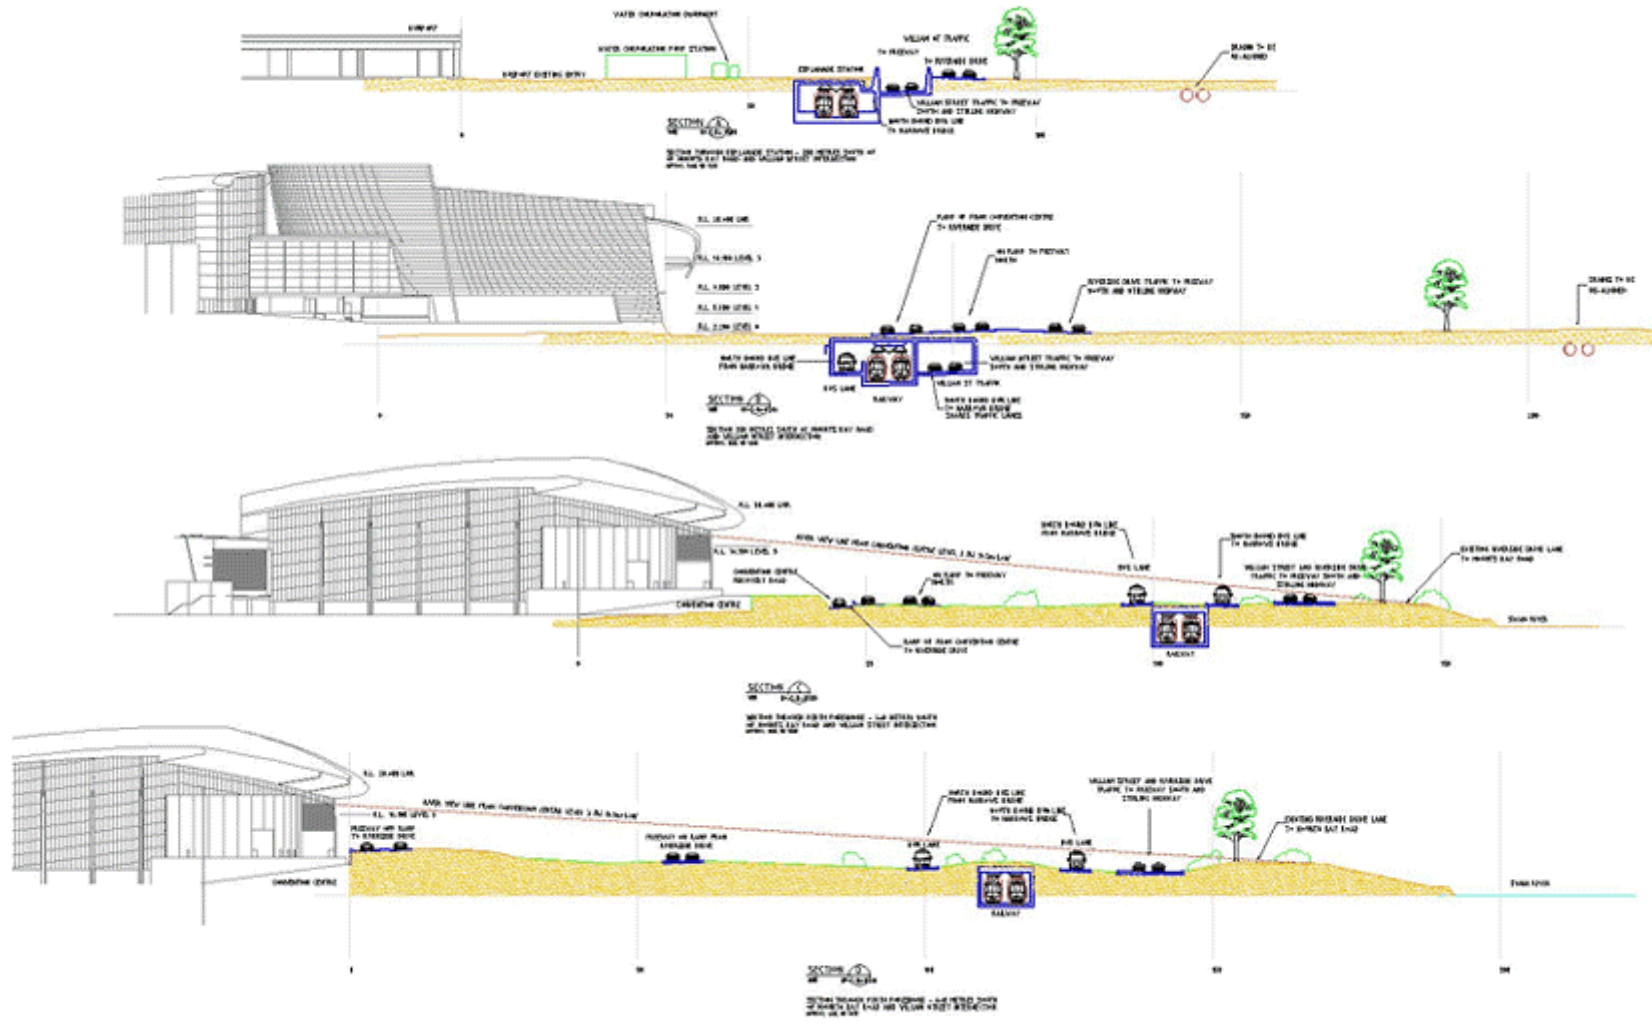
Cross Sections Showing View from Perth Convention Centre with William Street Bridge Removed
